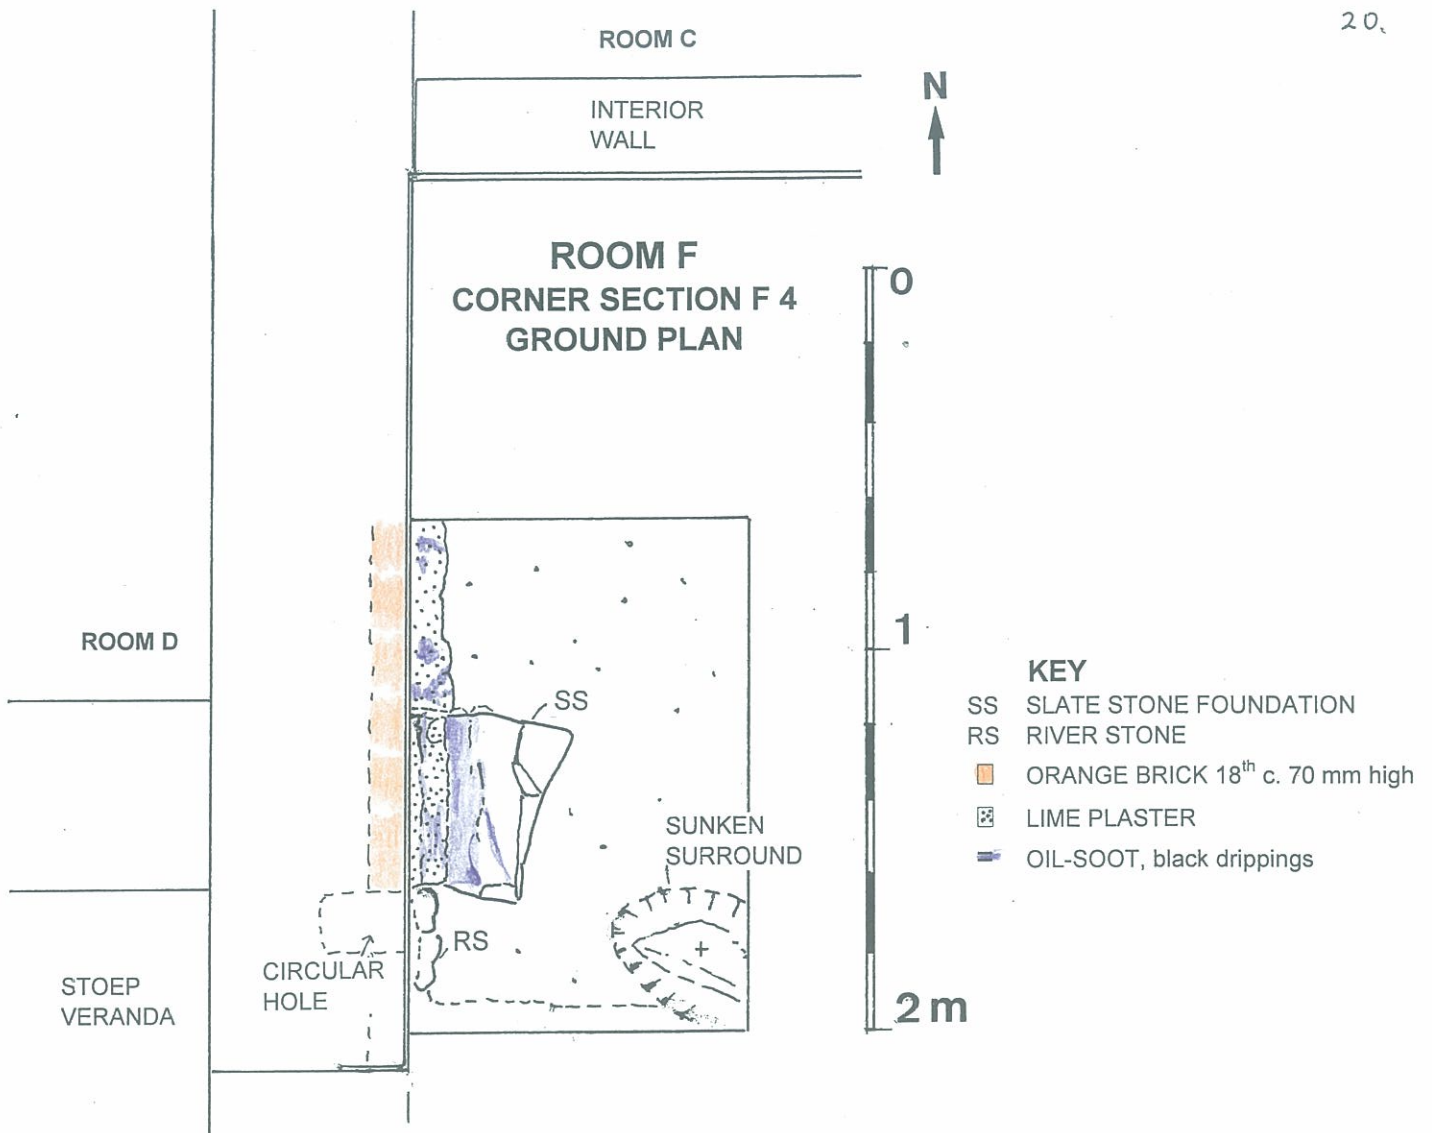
Ground plan of section F4 in Room F (*Agterhuis*). The slate slab (no further foundations) as a base for a full width screen. Note the oil-soot drippings.
